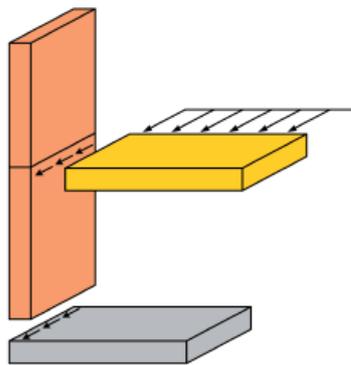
Showing how the horizontal slab loads are transmitted through the wall sheeting to the ground. (Källsner & Girhammar 2008)
